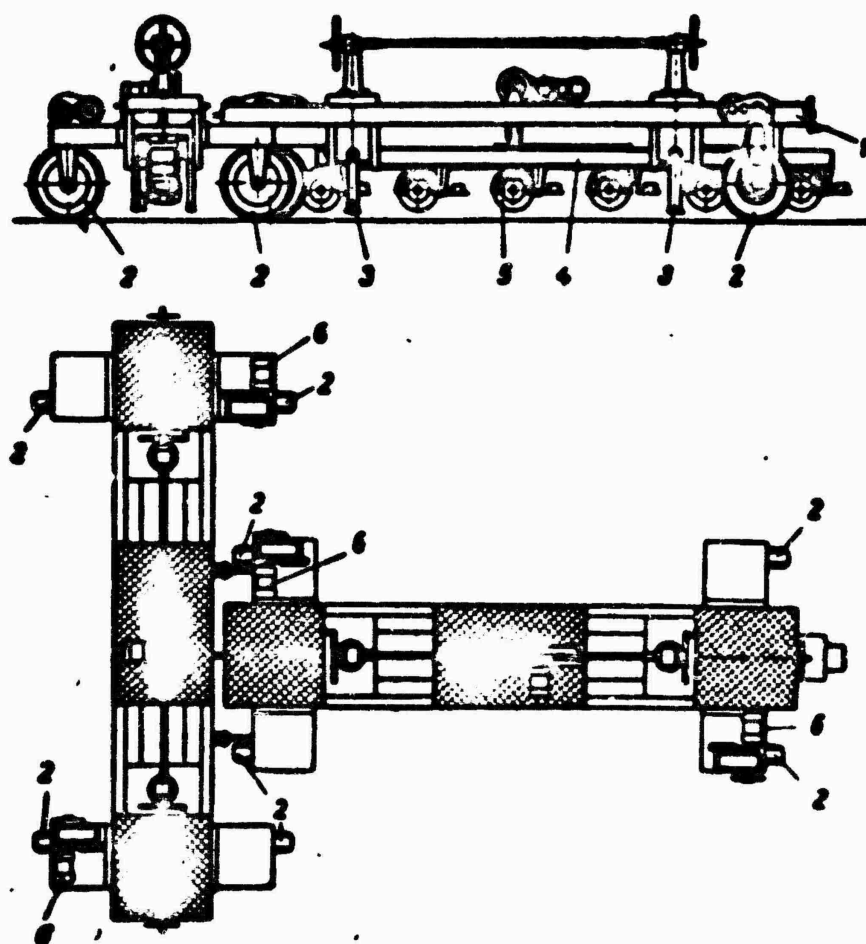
Multidisk joint sawing machine. 1) Frame; 2) pneumatic-tired wheels; 3) support brackets; 4) portable cart with disks; 5) abrasive disks; 6) electric motor.
